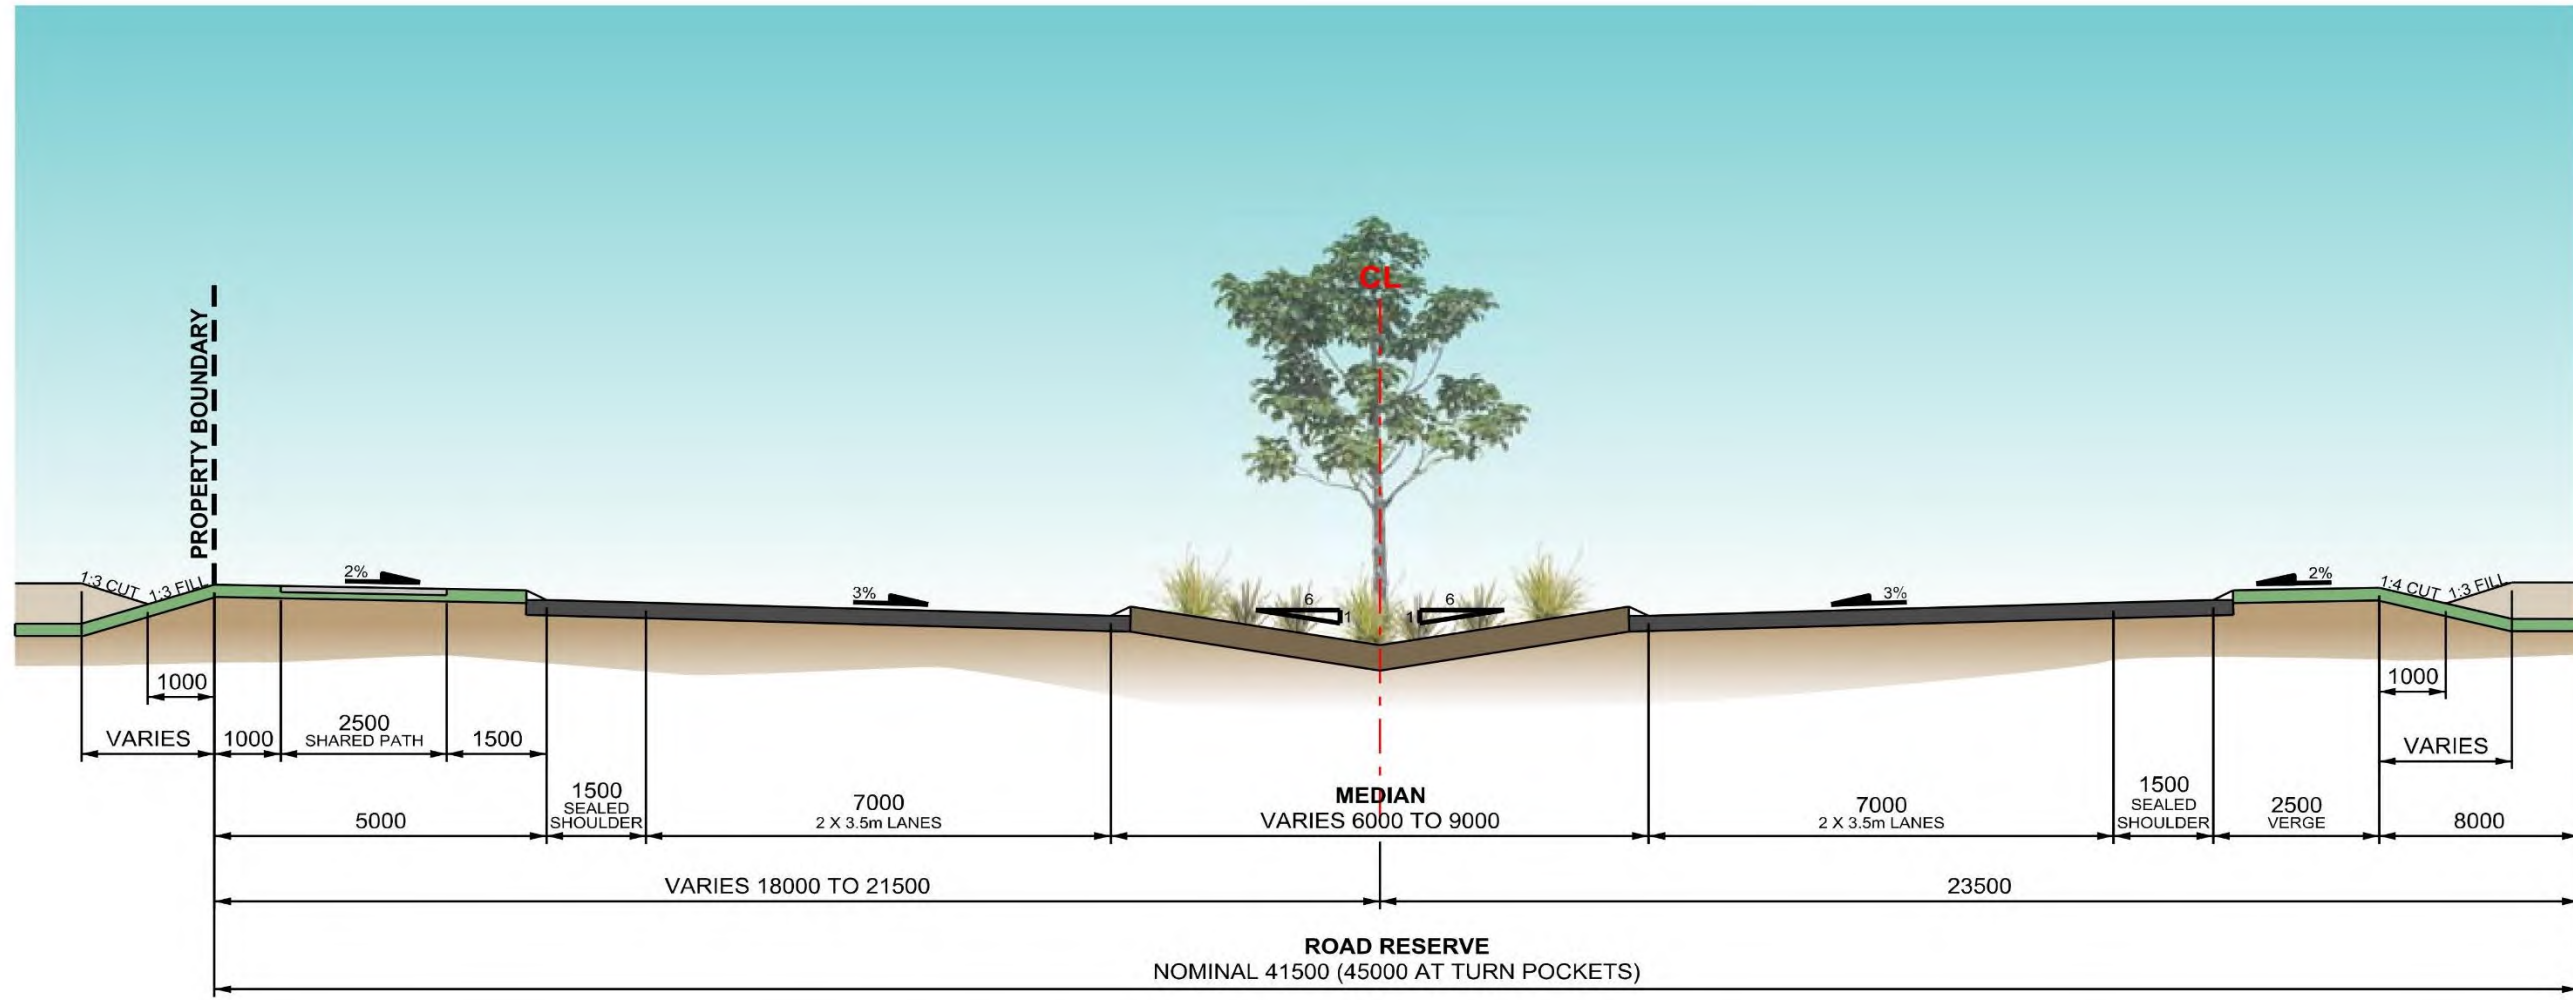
Indicative Cross-Section of Proposed Road Subject to Detailed Design
